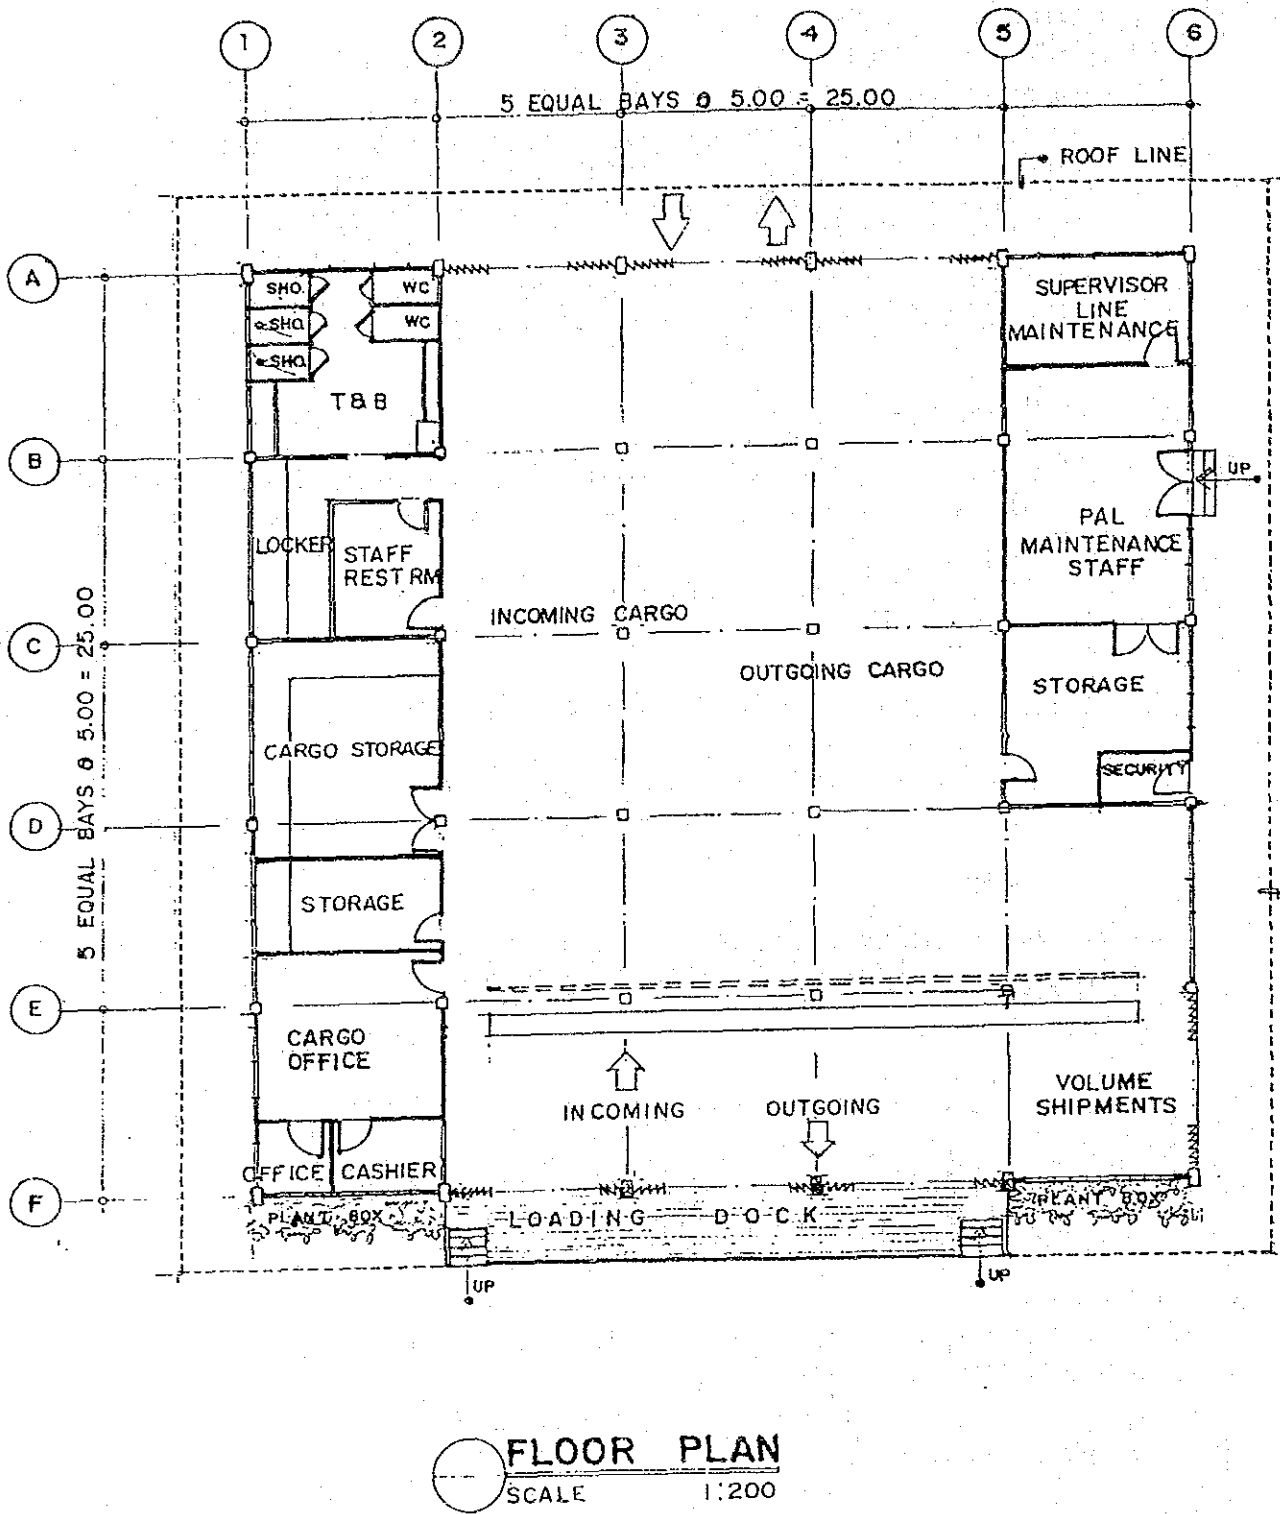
Floor Plan of Existing Cargo Terminal Building
